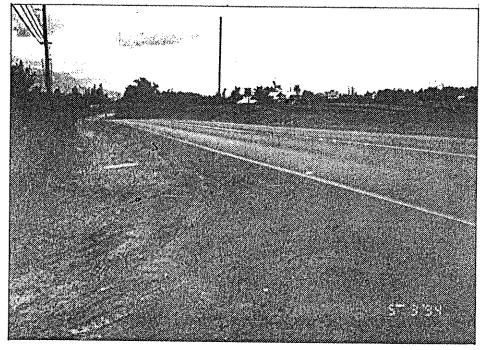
SITE 3 - KILAUEA RANCH AREA
